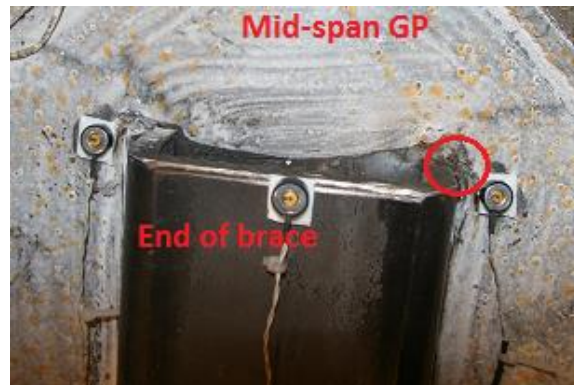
GP crack at N brace-to-gusset weld (PC1).
